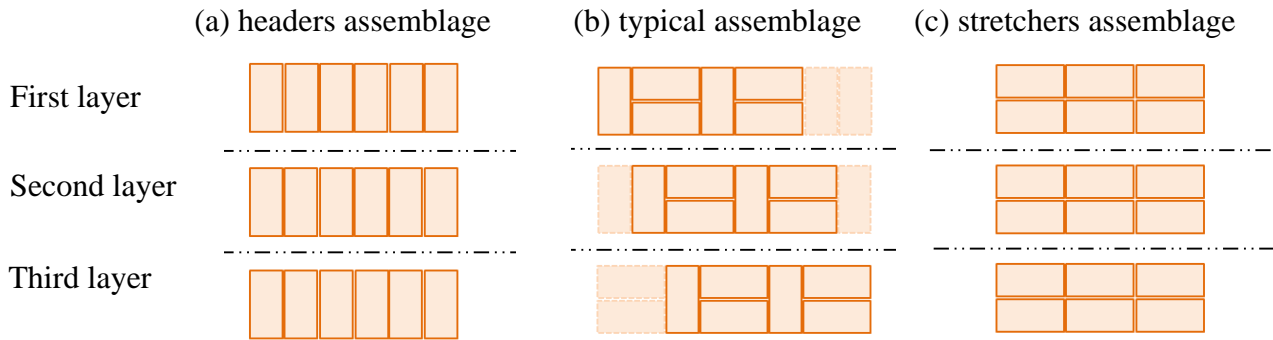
Top view of three different assemblages with headers and stretchers. (a) An assemblage using only headers. (b) A typical assemblage respecting the standards of dry stone construction. (c) An assemblage using only stretchers.
